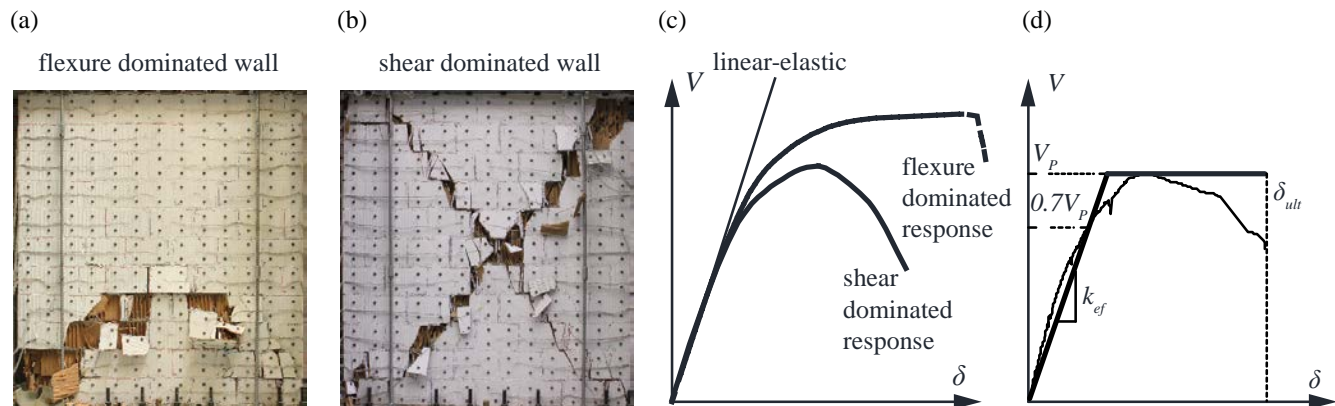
a Photo of flexure dominated wall at failure [1], b Photo of shear dominated wall at failure [1], c Shear load-drift curves qualitatively representing typical flexure and shear response of an in-plane loaded URM wall, d Monotonic shear load-drift response of a URM wall test in [1] as well as possible bi-linear approximation with indication of the effective stiffness (k_{ef}), the peak shear resistance (V_p) and the ultimate drift capacity (δ_{ult}).
